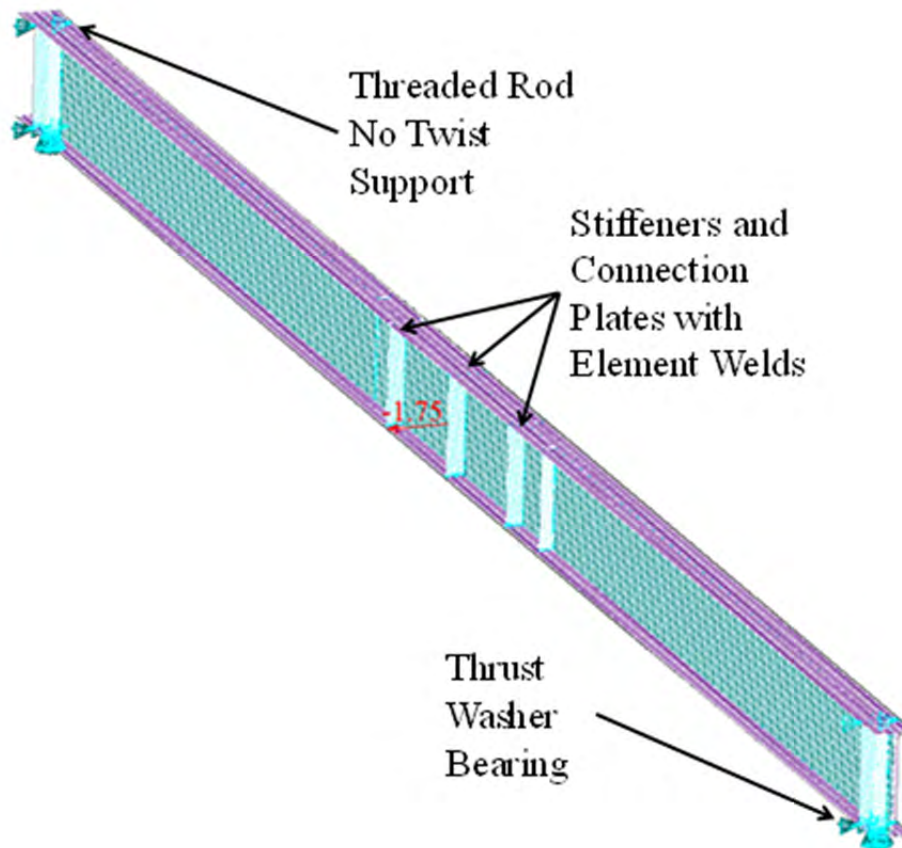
W30x90 single girder (GBP2) lateral deflection finite element model
